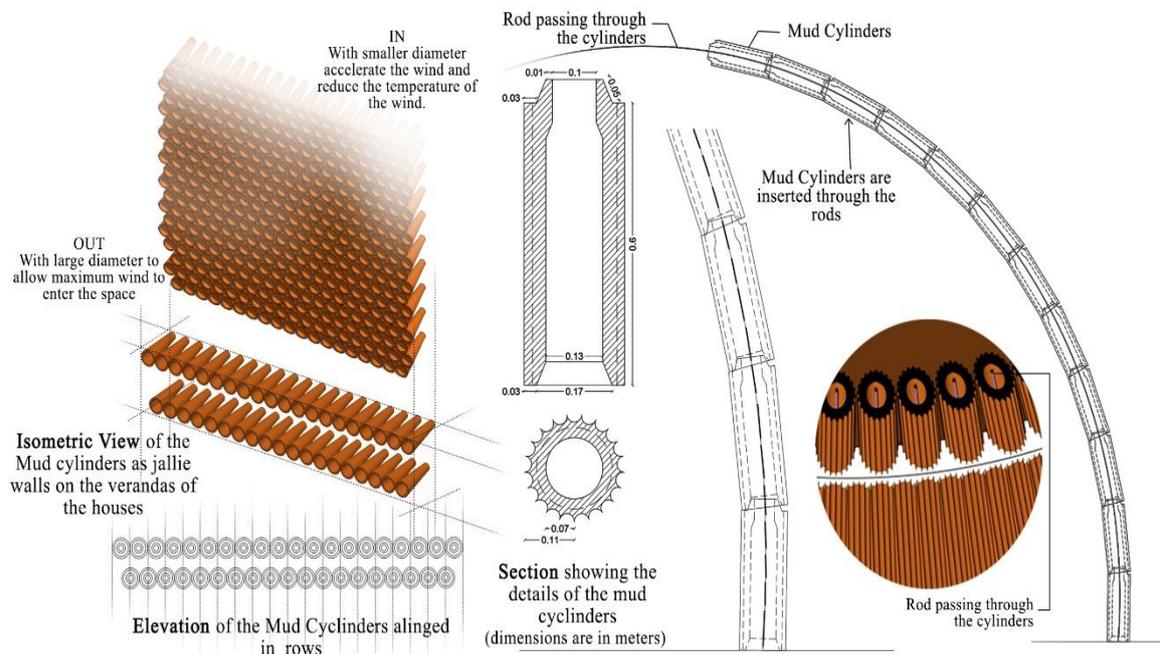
Details of proposed mud cylinder with steel reinforcement used for the construction of the dome houses
